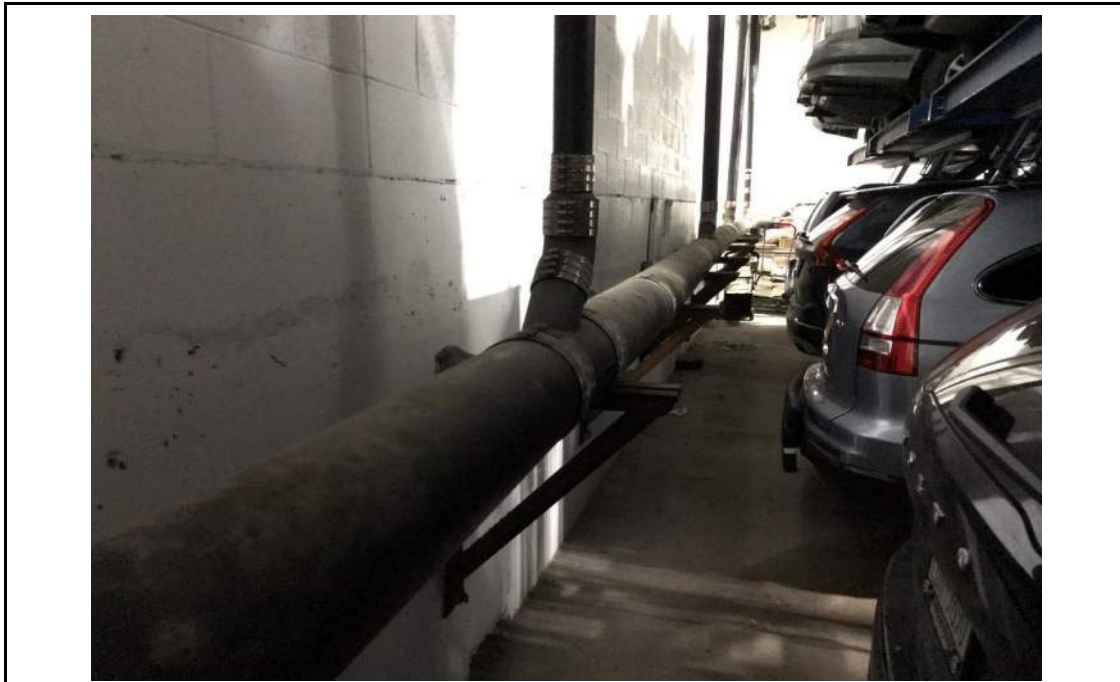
Subgrade parking lot concrete foundation wall (beneath the first floor), facing east. 6 February 2020.
